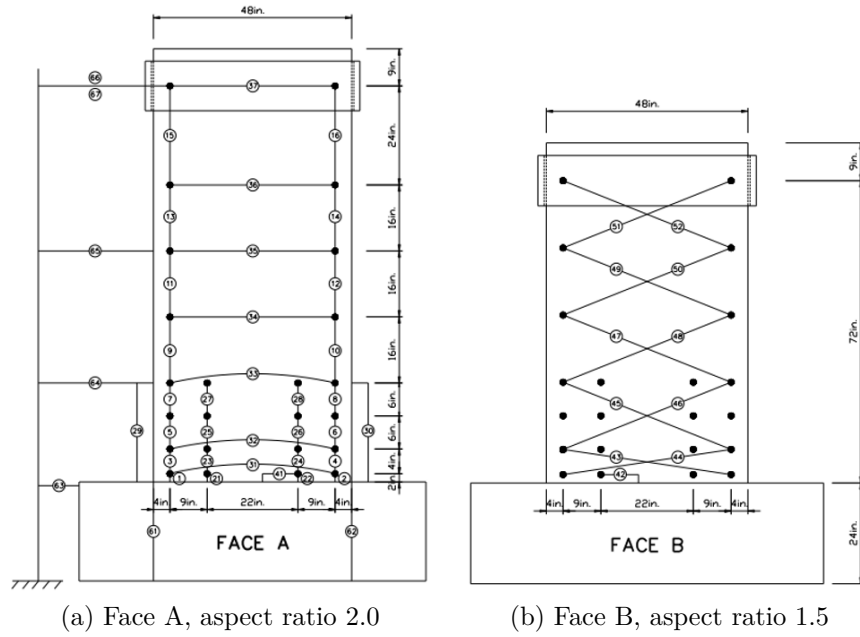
LVDTs layout of wall specimens (Tran, 2012).
